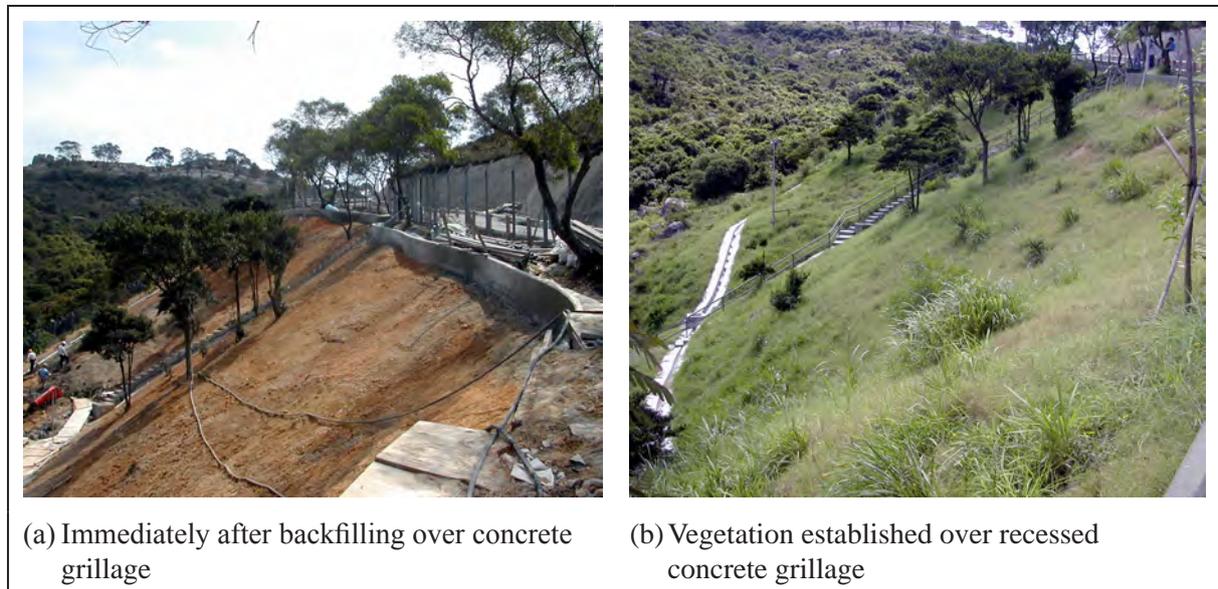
Use of Buried Concrete Grillage for Fill Slopes
